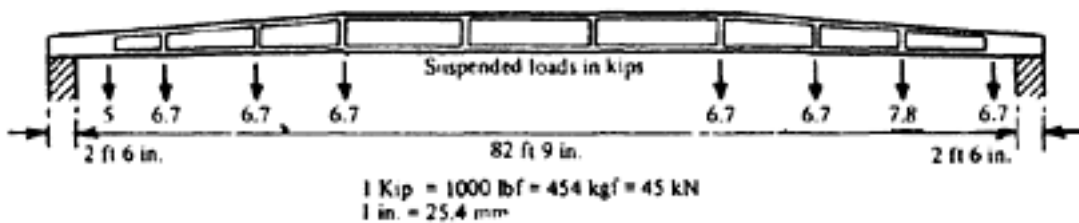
Elevation of roof beam at Sheffield Victoria station
